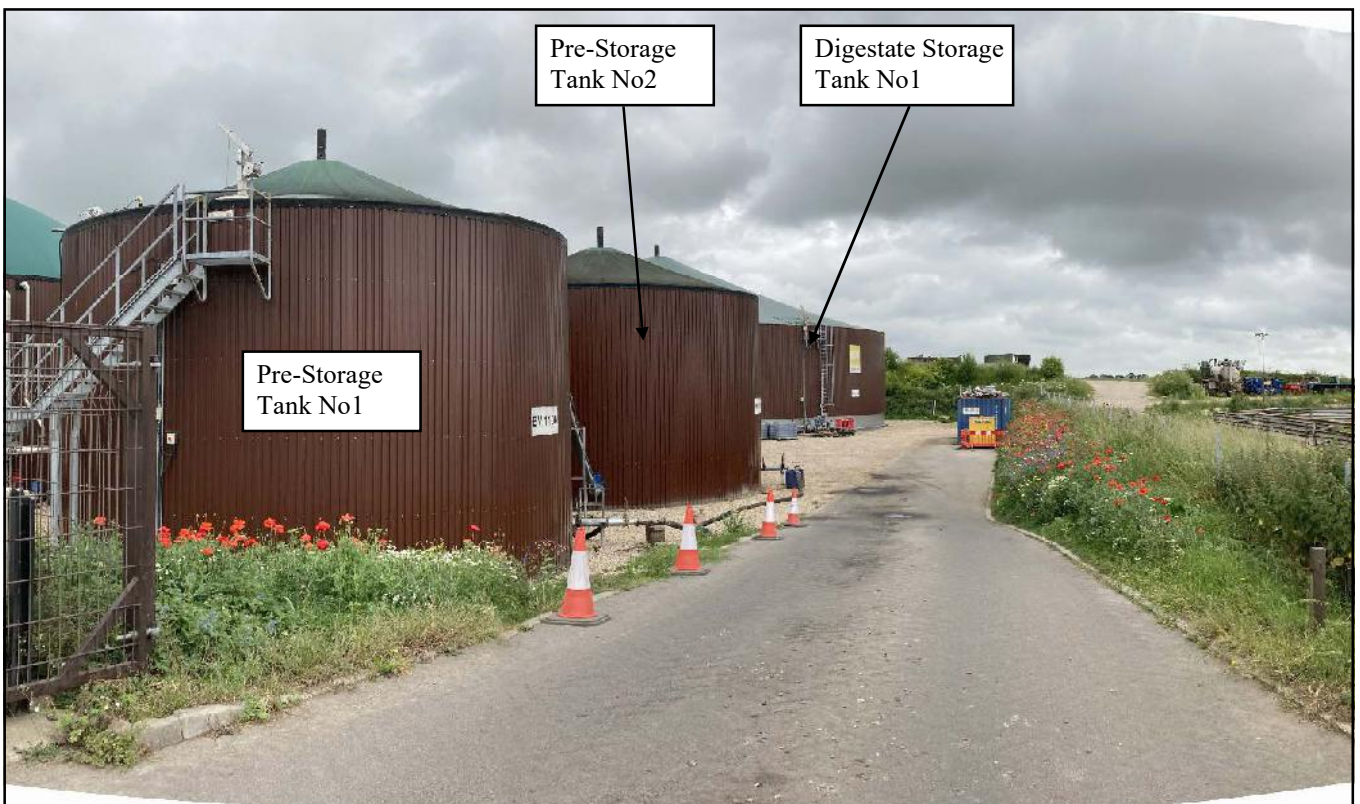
View of AD Facility from gate at top of access ramp looking east.
